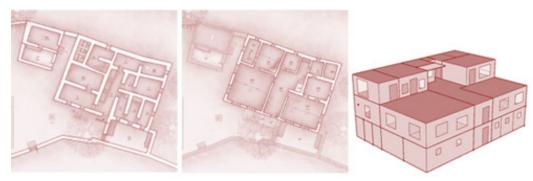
Hanugan house ground floor plan, first floor plan and simulation model. Source: Author
